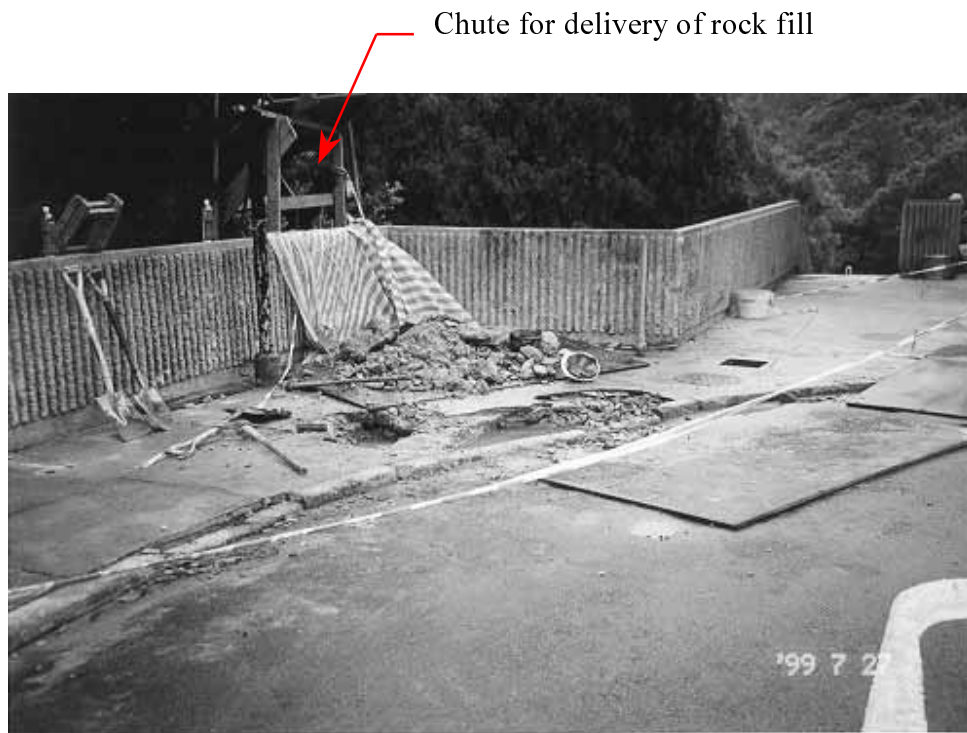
View South-East across Driveway and Footpath at Crest of Slope above Landslide Location Showing Damage Caused by Heavy Vehicle. Chute for Delivery of Rock Fill to Toe of Slope Visible above Concrete Barrier Wall (Photograph Taken on 27 July 1999)
